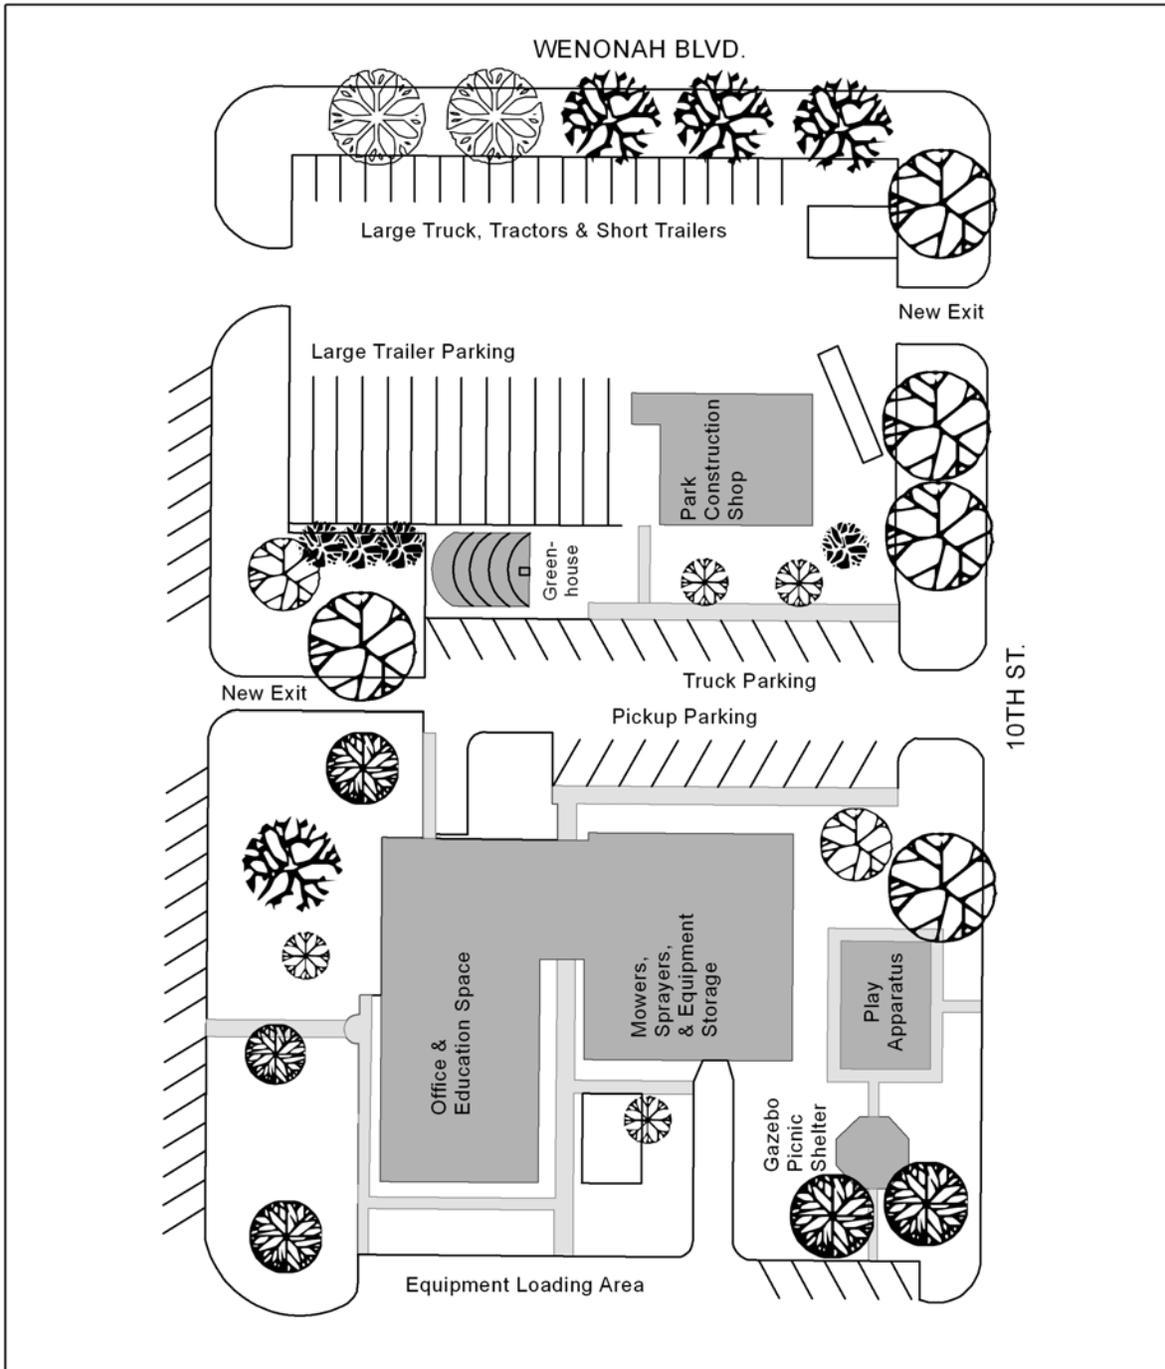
Map of Proposed Site Reuse Plan for Wichita Falls USAR Center
